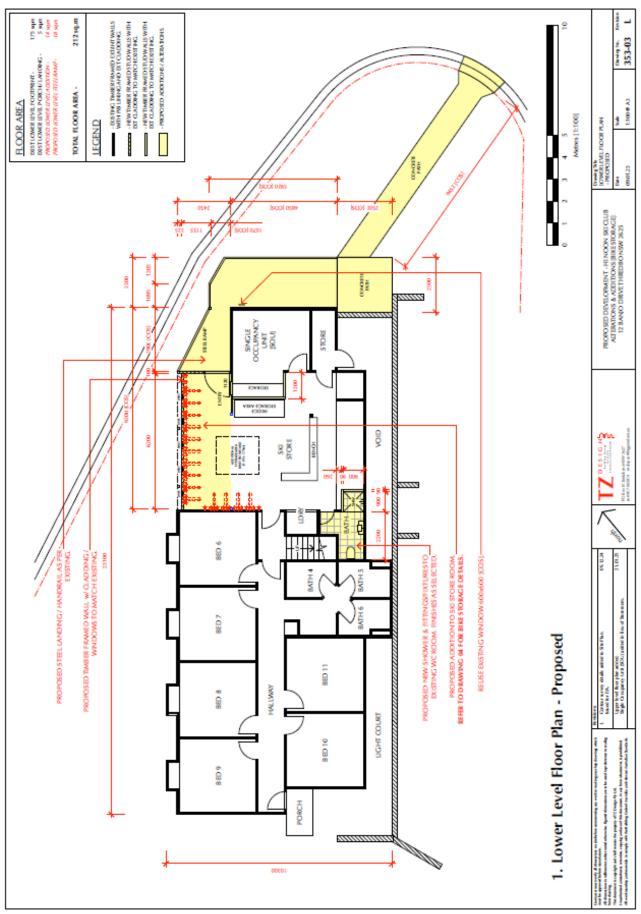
Lower Level Floor Plan - Proposed (Source: TZ Designs, January 2025)
